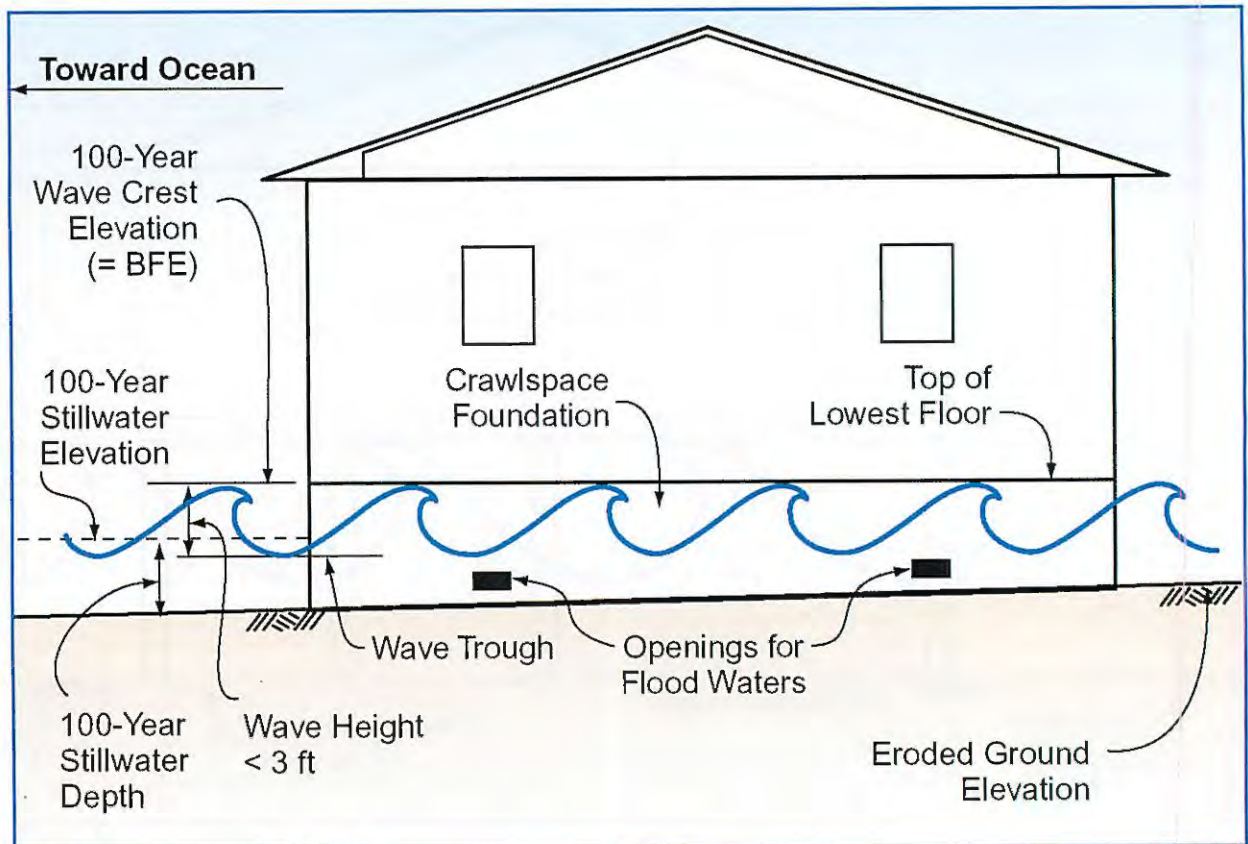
Minimum NFIP requirements for the A Zone (From FEMA, CCM, 2000). Under the National Flood Insurance Program, structures in the A zone must be elevated above the Base Flood Elevation and supporting walls must have openings to allow entry and exit of flood waters. Many coastal states define the A zone where wave height over the 100-year stillwater elevation is less than 3 feet. In Hawaii, the A zone is determined where the water depth from the 100-year flood event is less than 4 feet. Boundaries for the A zone are found in the FIRMs that are available at the building departments for each county.
